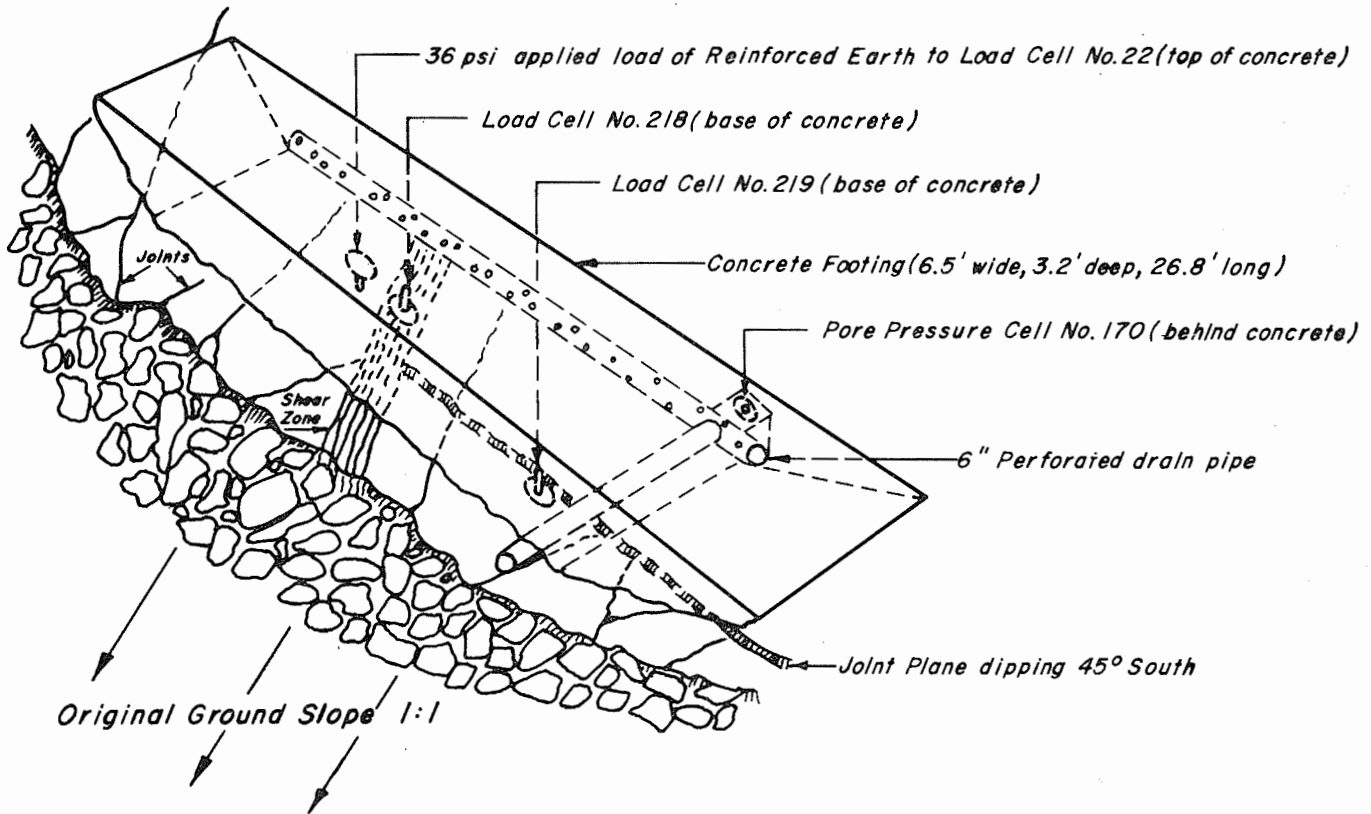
Schematic illustration of concrete pad at base of Reinforced Earth, with location of stress meters.
